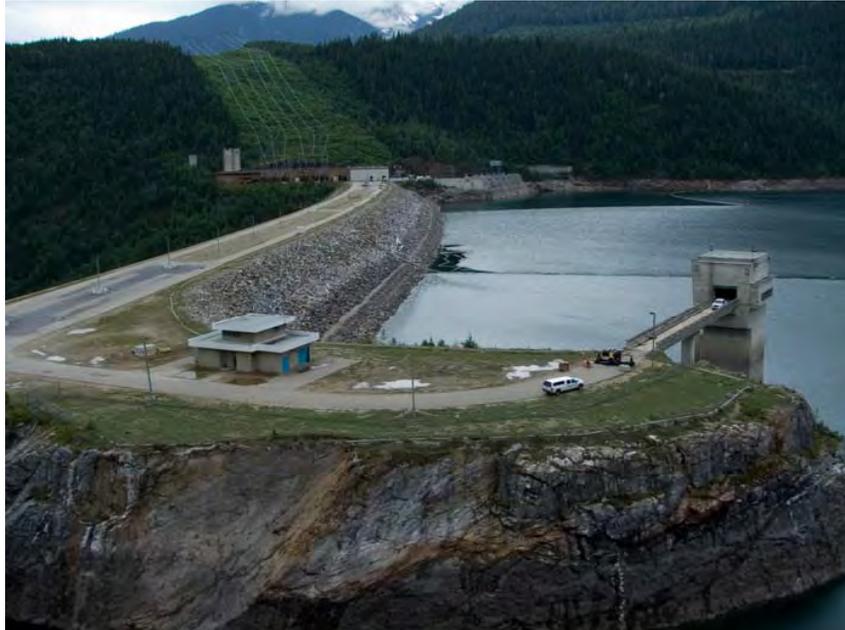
Mica Dam Crest showing Outlet Works Structure Beaker Building and Trans Lines
